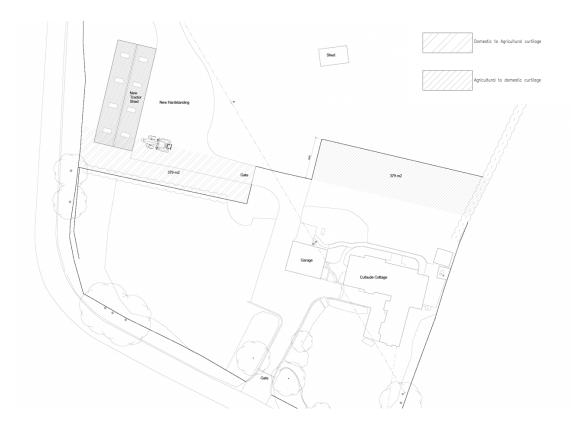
Plan showing the two parcels of land for a proposed 'land use swap' and
